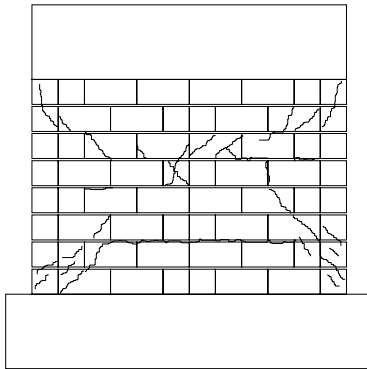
Typical failure mode for hollow concrete masonry walls with reinforcement in the vertical joints.
